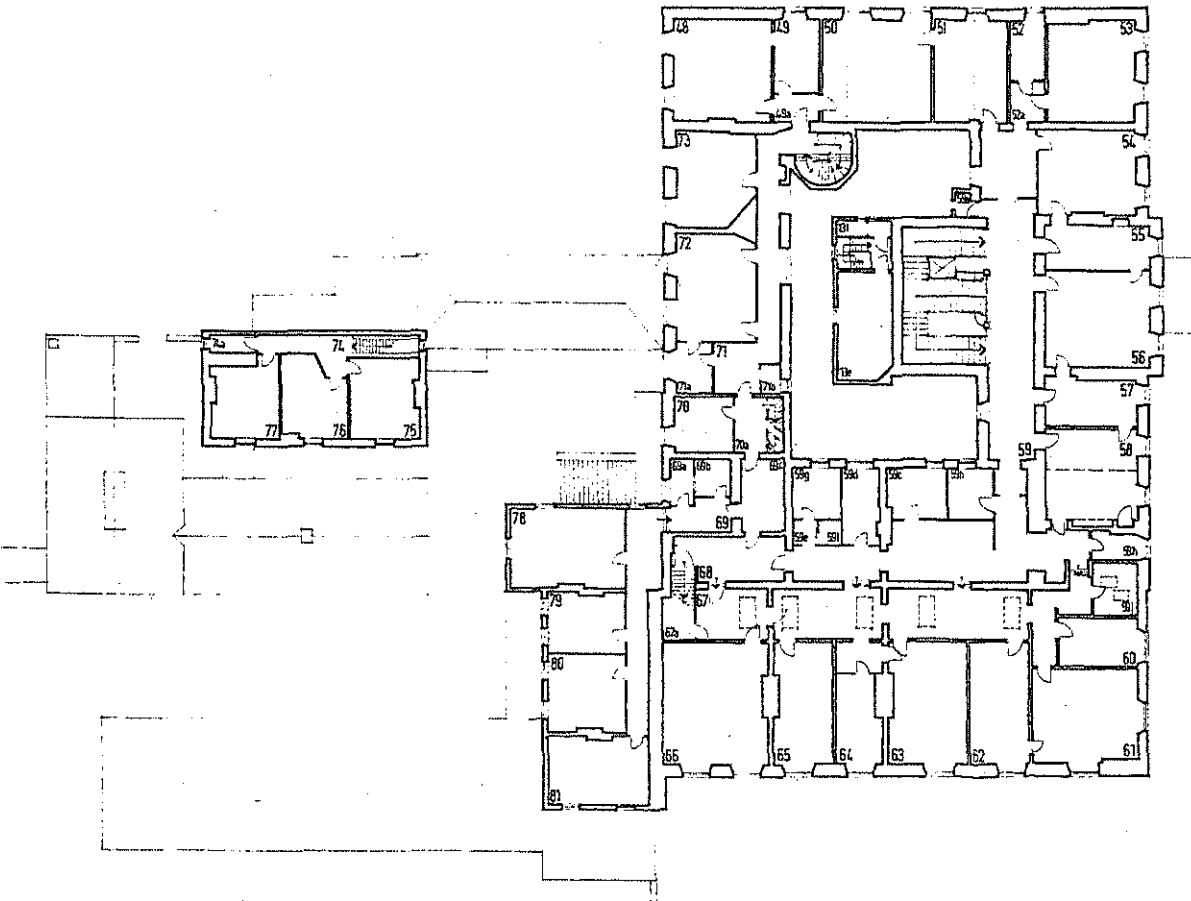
Second-floor plan (Louis Hawkins, Architect)
